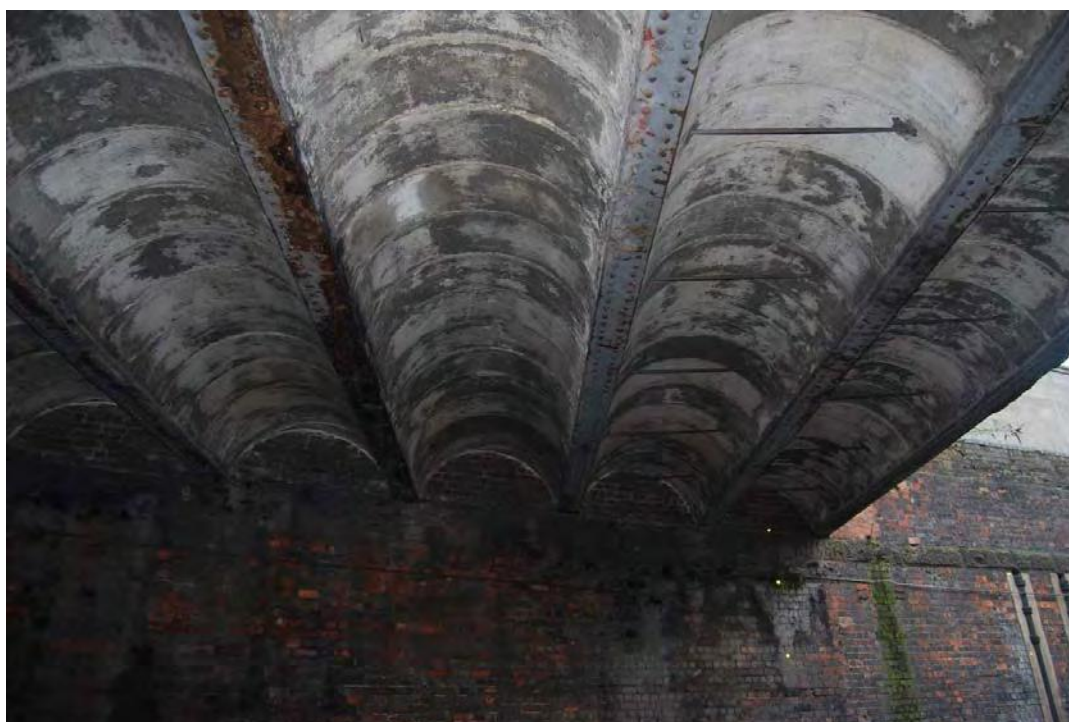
The underside of the bridge. The steel frame and concrete arches are clearly visible. Looking south.
